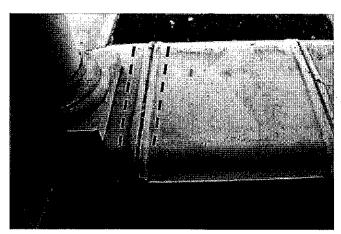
Figure F: Open joints between railing units allow water to seep into railings and walls, hastening the deterioration of terra cotta and masonry below.
